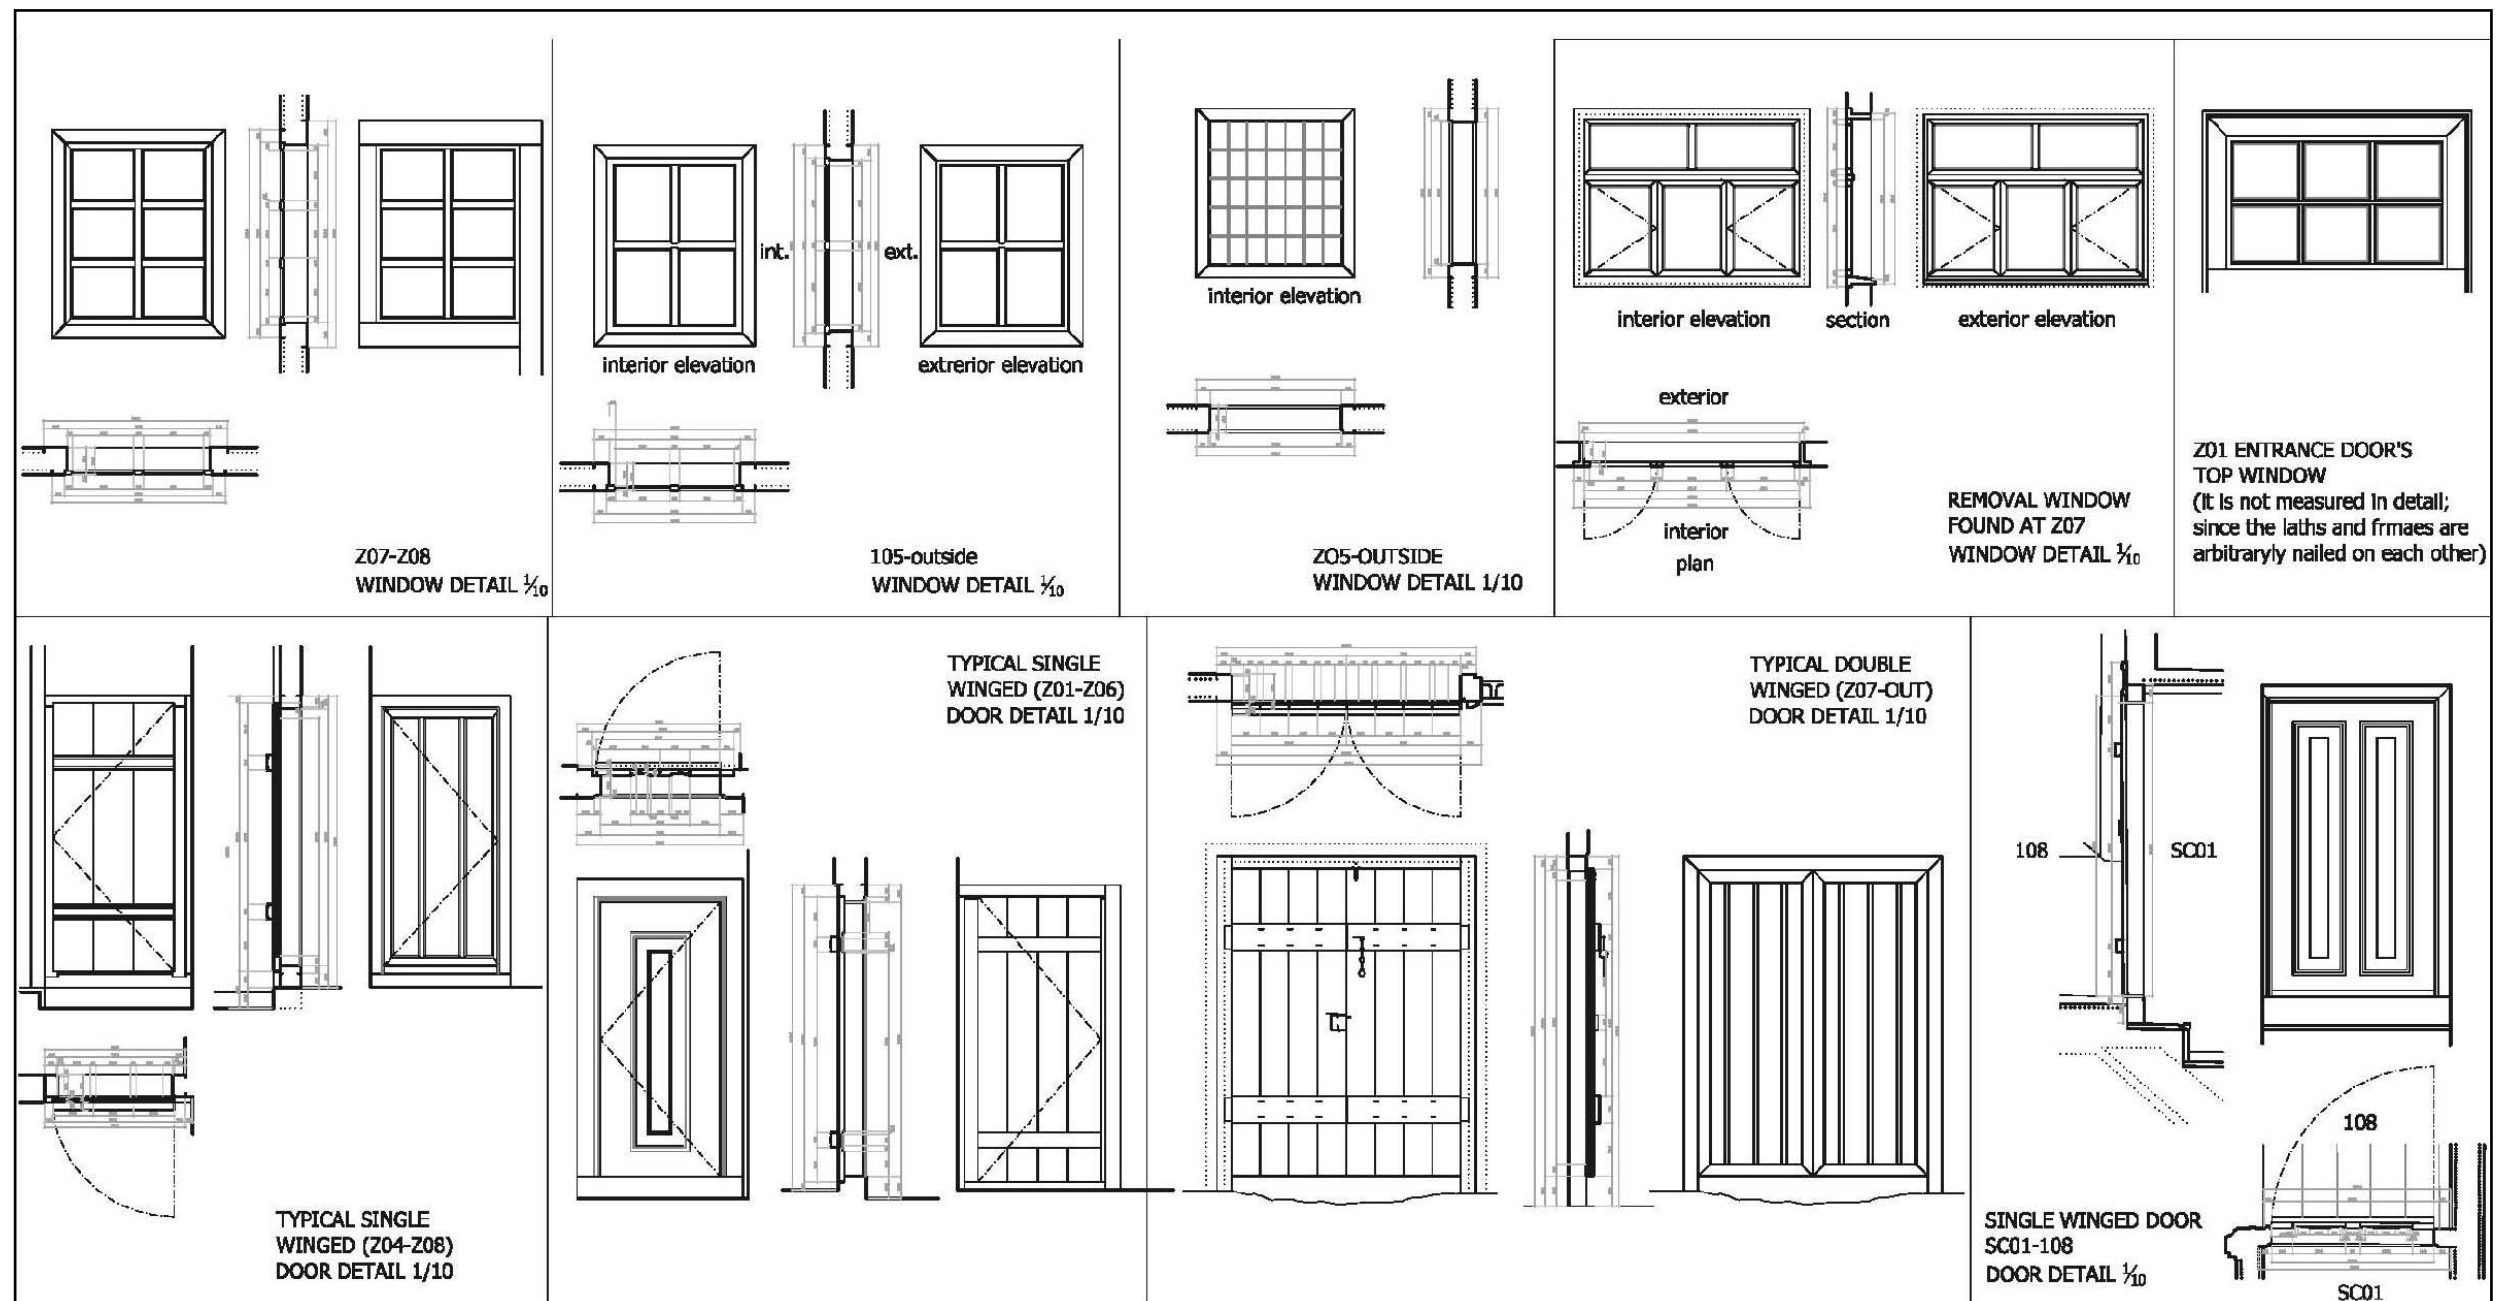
Details of Doors and Windows - Part 2: scaled into 1/50 (presented in 1/10 at Jury)
